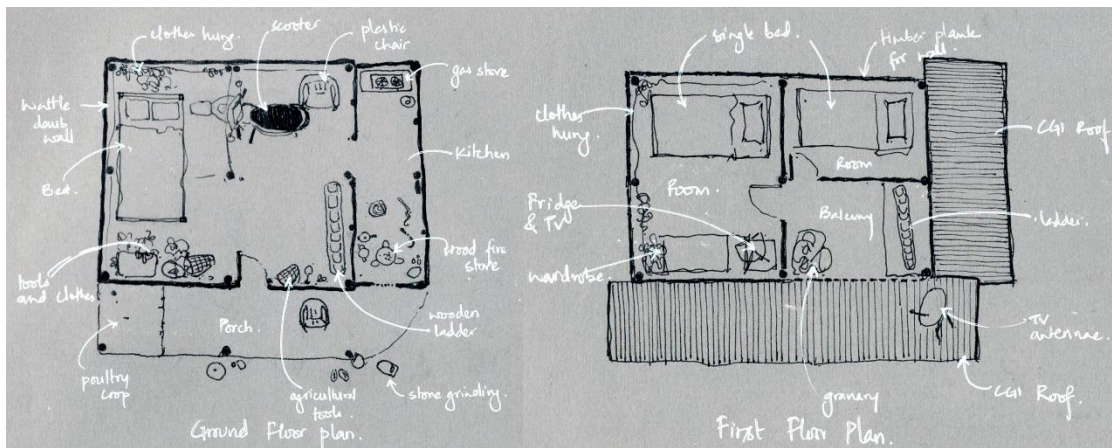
Floor plans depicting internal space arrangement in a double storey house of a *Mahato* family in the Bhutaha Tole. – sketch by the author.
